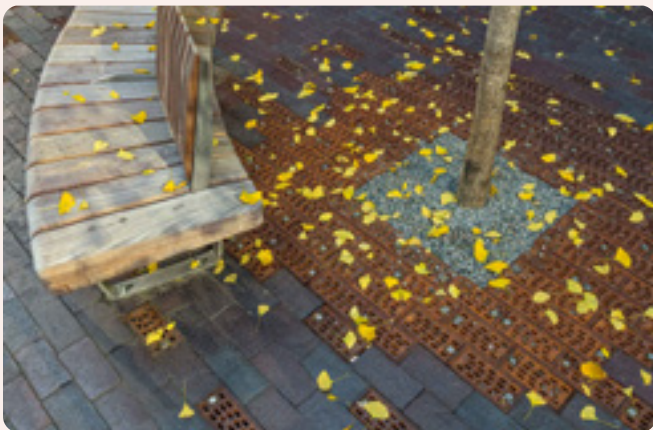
Broad St, Boston features porous brick pavers around tree pits.
